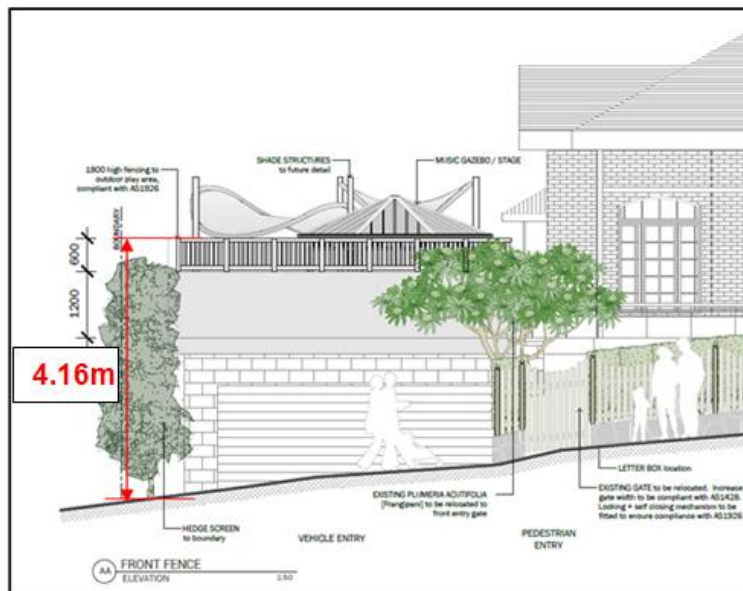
Overall height of basement wall and acoustic fence above, as viewed from Rowe Street.
